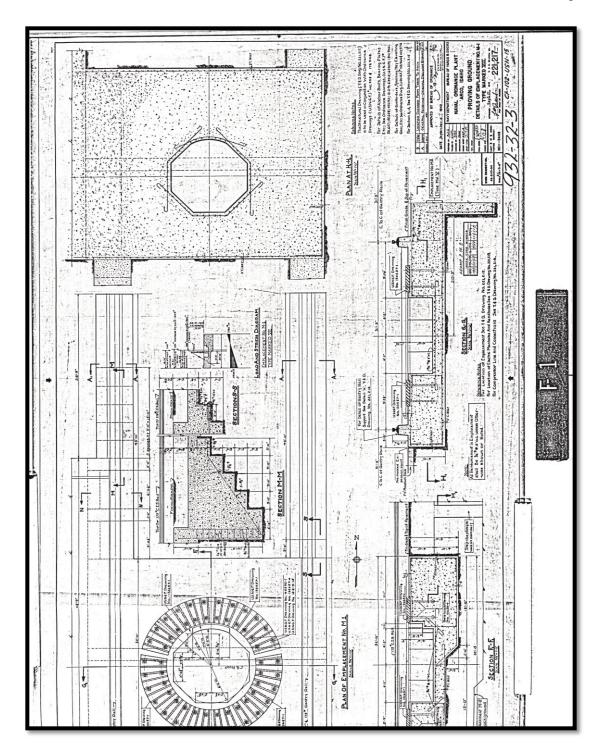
INL drawing number 112118 (CF-102-USN-15); proof / gun emplacement area, details of emplacement no. M-1, type marked VII; frame 1 of 2; September 1942.
